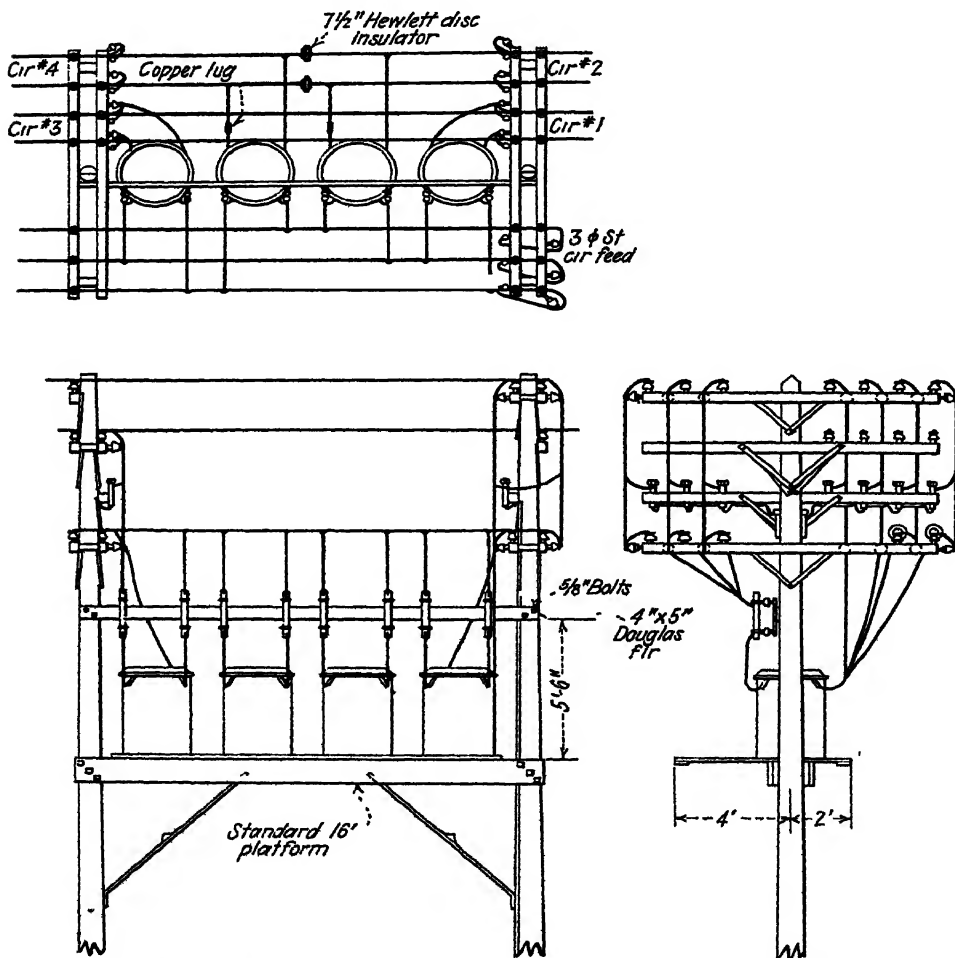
Street-lighting transformers on platform, showing fuses mounted on beam
